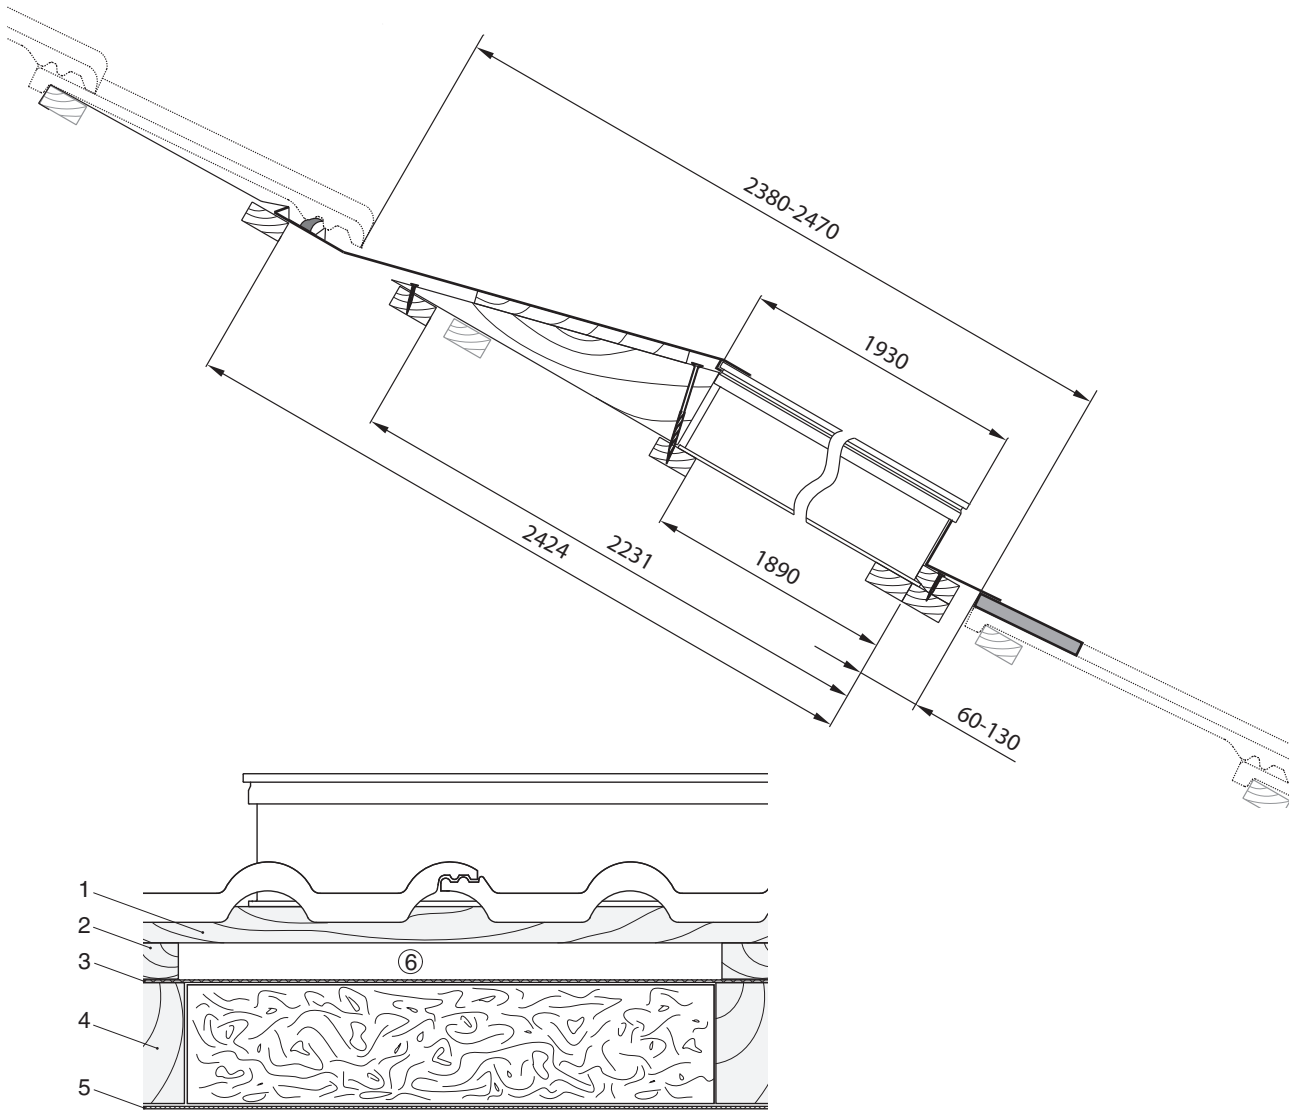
In roof installation longitudinal section (upper drawing) and cross section (lower drawing).
